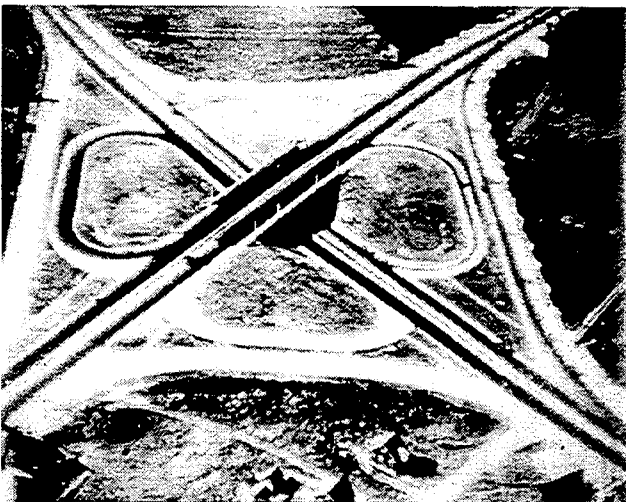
First Intersection Constructed in USA, Woodbridge, New Jersey, 1928
